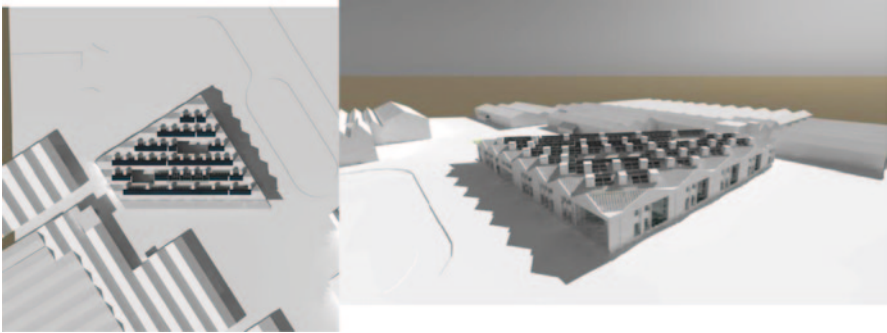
a The building outline is orientated to the site, but the roof form is orientated to the solar geometry. b The model shows the array of roof cowl and rooflights. (FCB Studios)
